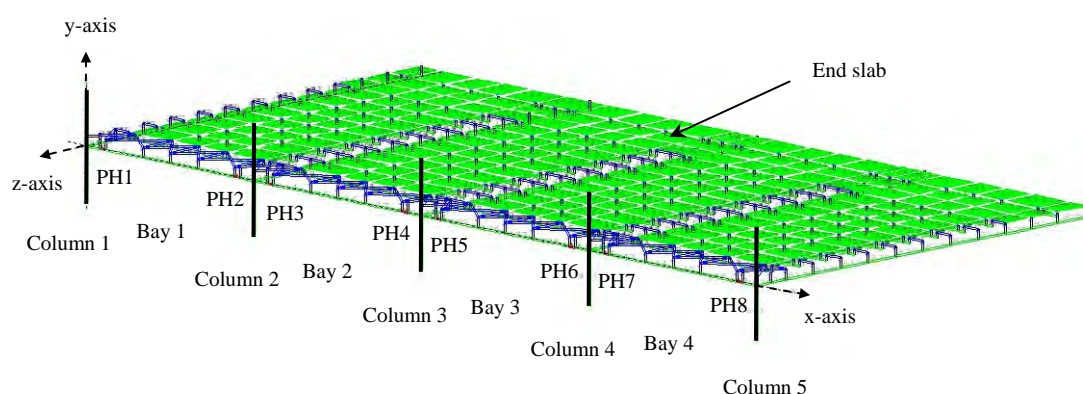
Layout of the 4-bay perimeter frame-floor model
